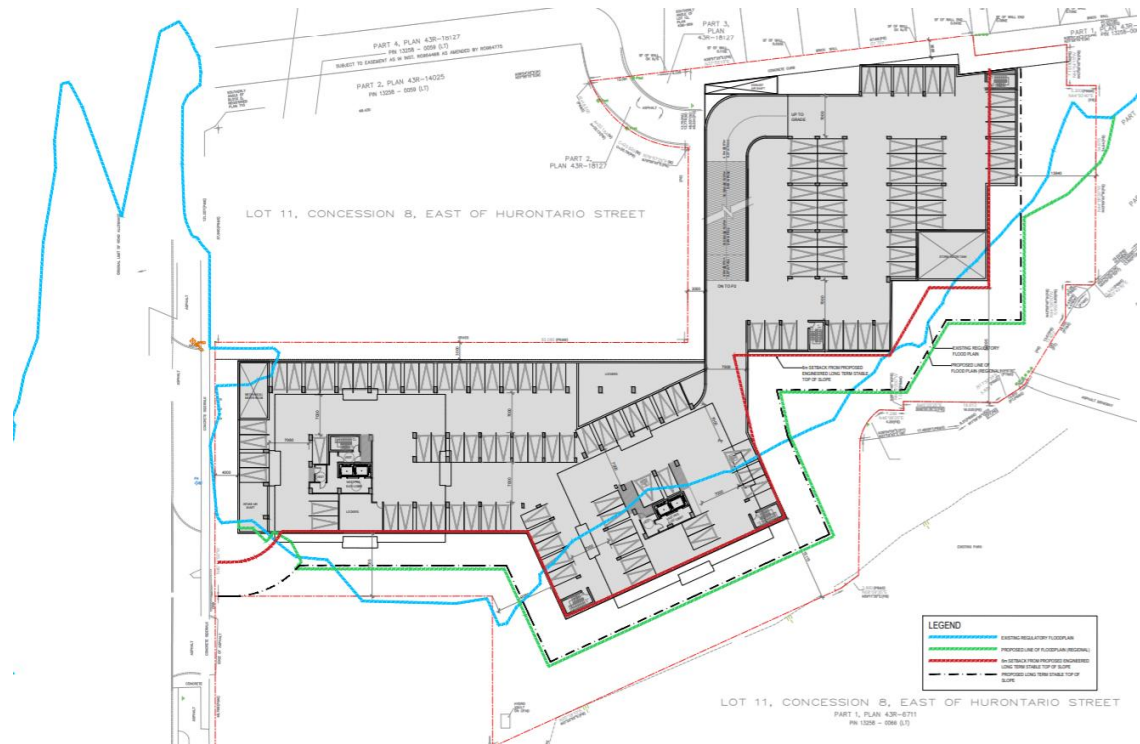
Level 1 of Underground Parking Plan, Prepared by IBI Group
